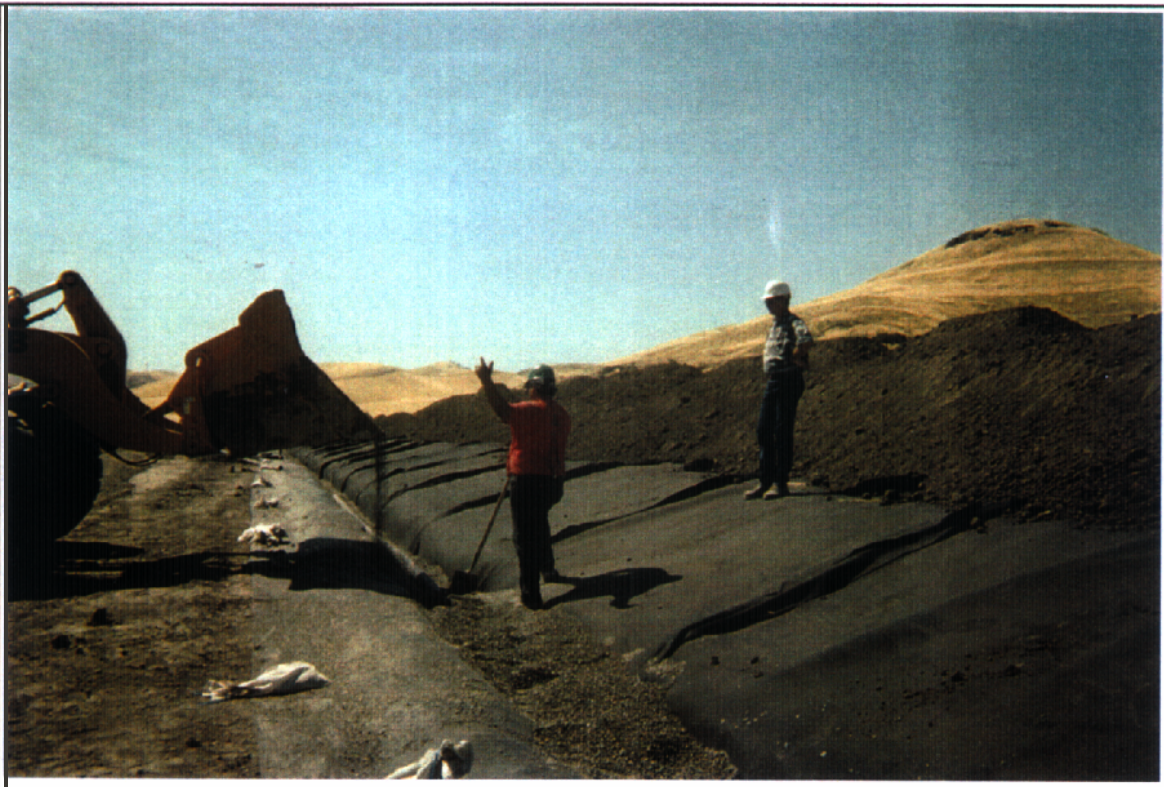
Subdrains were 2-foot deep consisting of geotextile, drain rock, and HDPE pipe.
